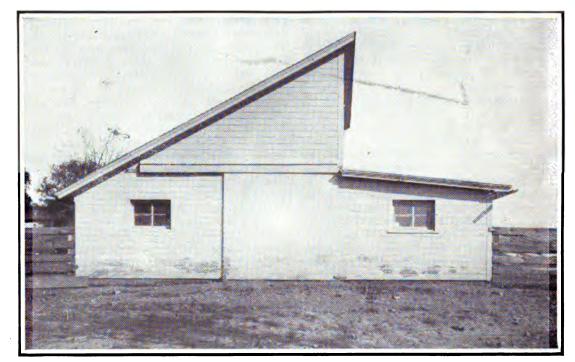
HOUSE FOR PIGS (SIDE ELEVATION).
